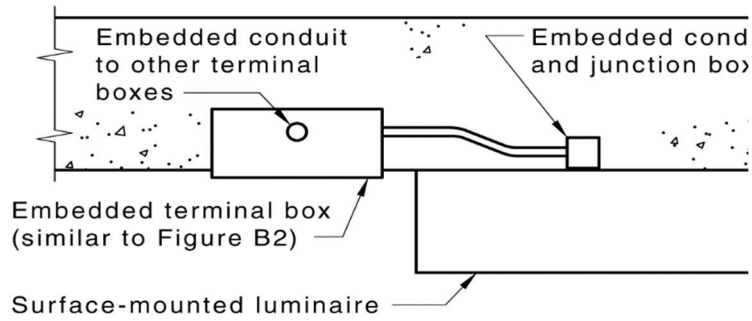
TYPICAL LAYOUT OF EMBEDDED TERMINAL BOX AND SURFACE-MOUNTED LUMINAIRE
